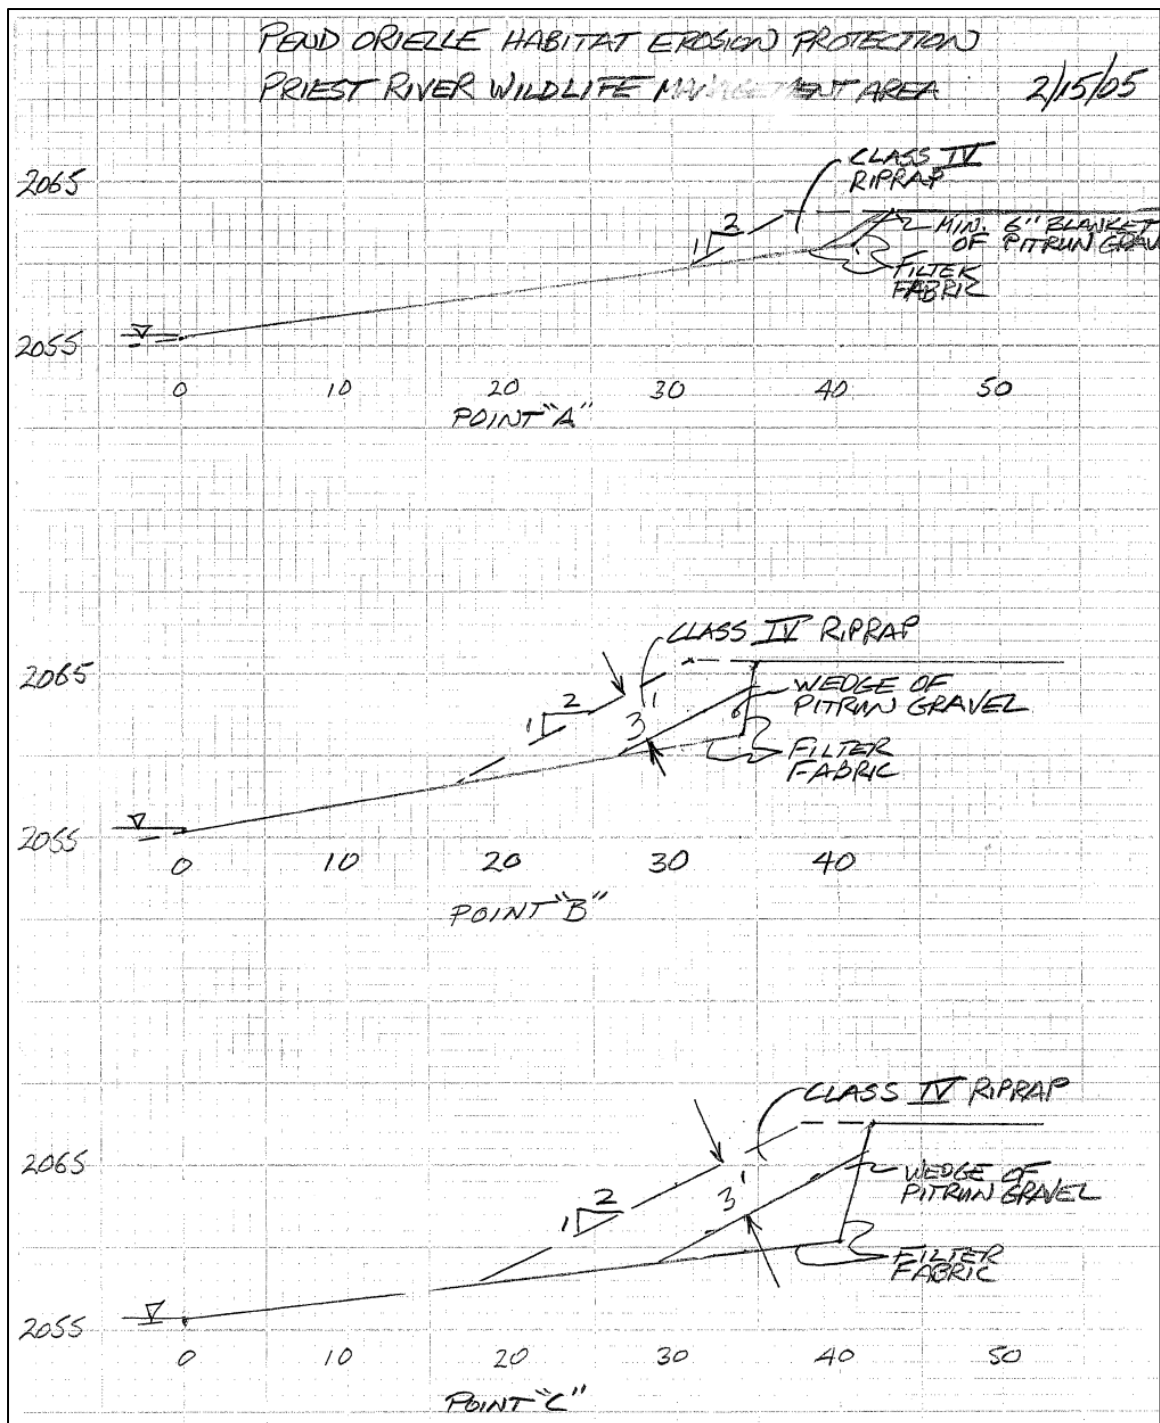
Priest River project plan and design details, bank profile from east to west.
